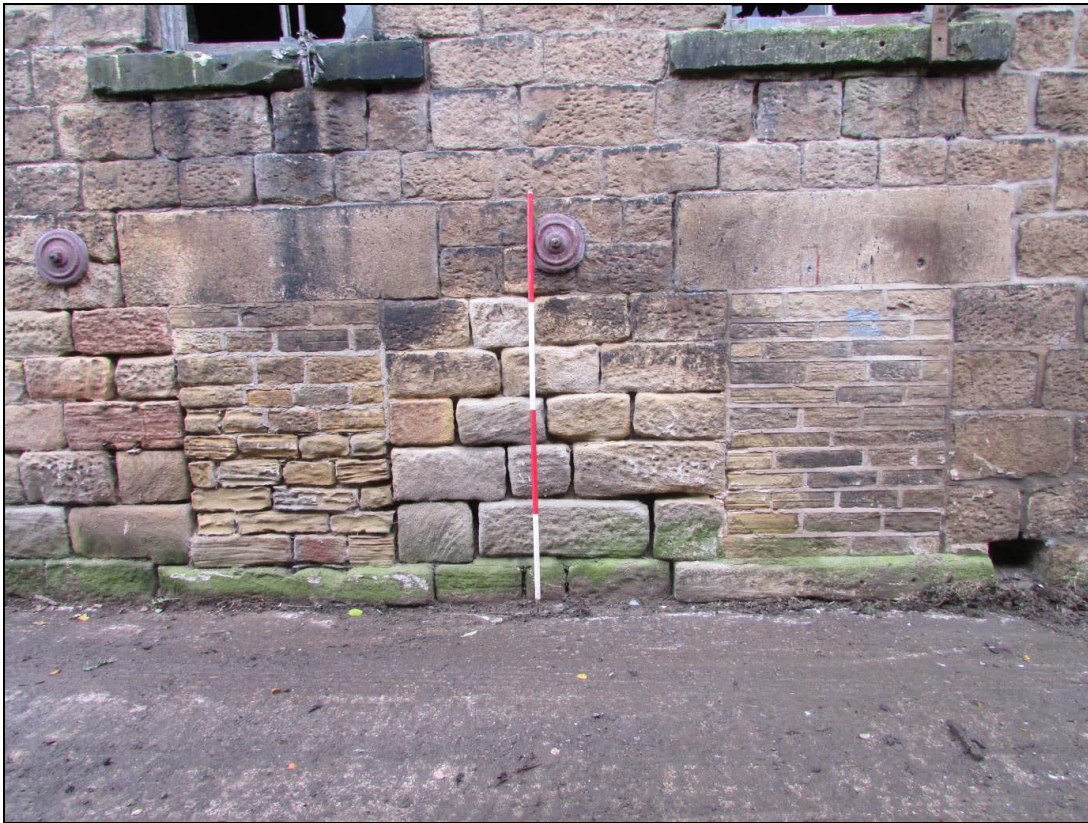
Two former windows blocked up on the ground-floor of the engine house
